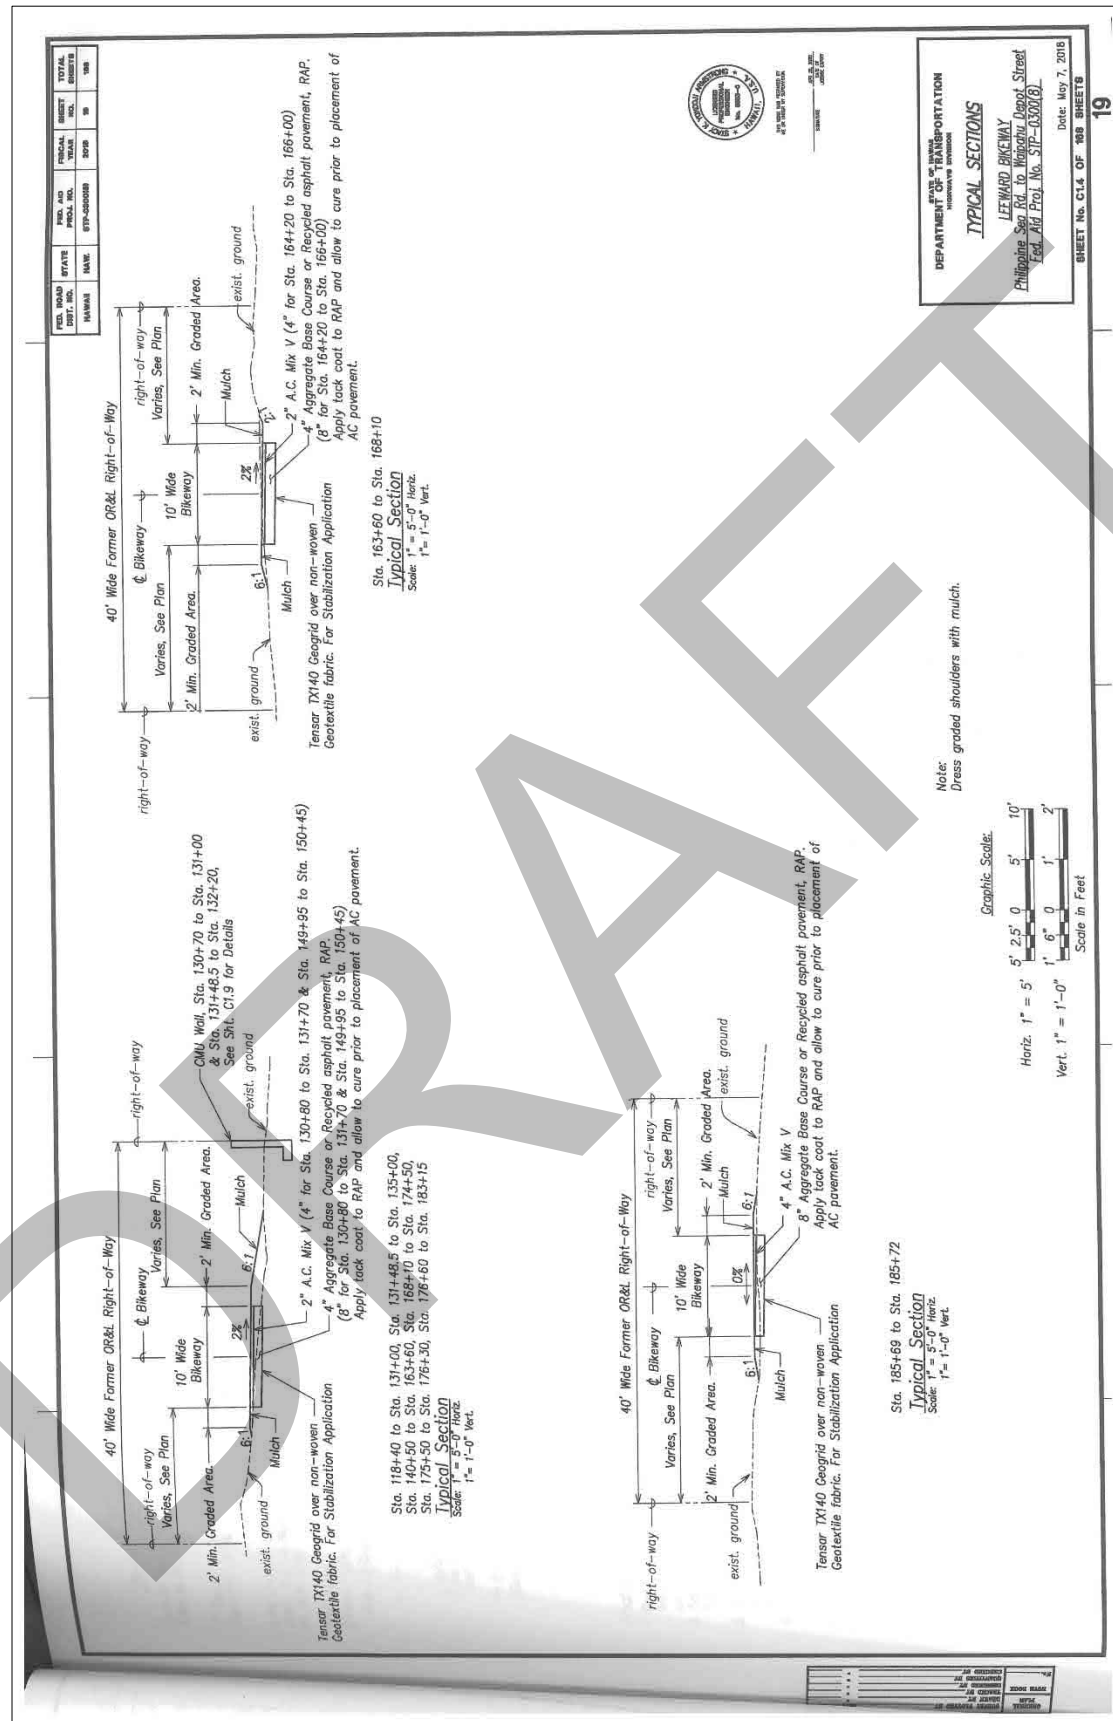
Bikeway plans showing typical cross-sections of the construction.
